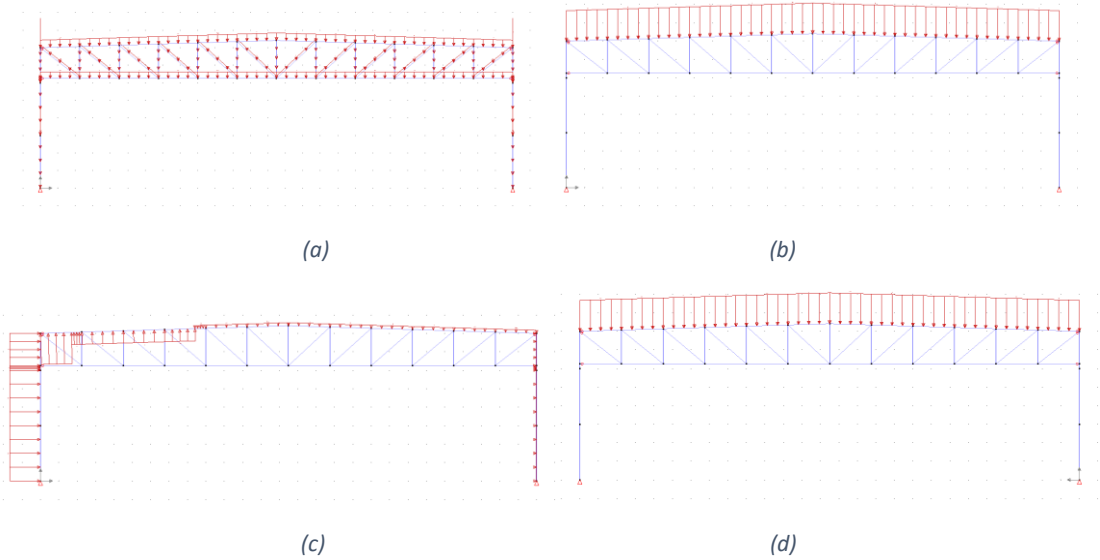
Load summary with: (a) Self-weight, (b) Roof load, (c) Wind load, (d) Snow load
